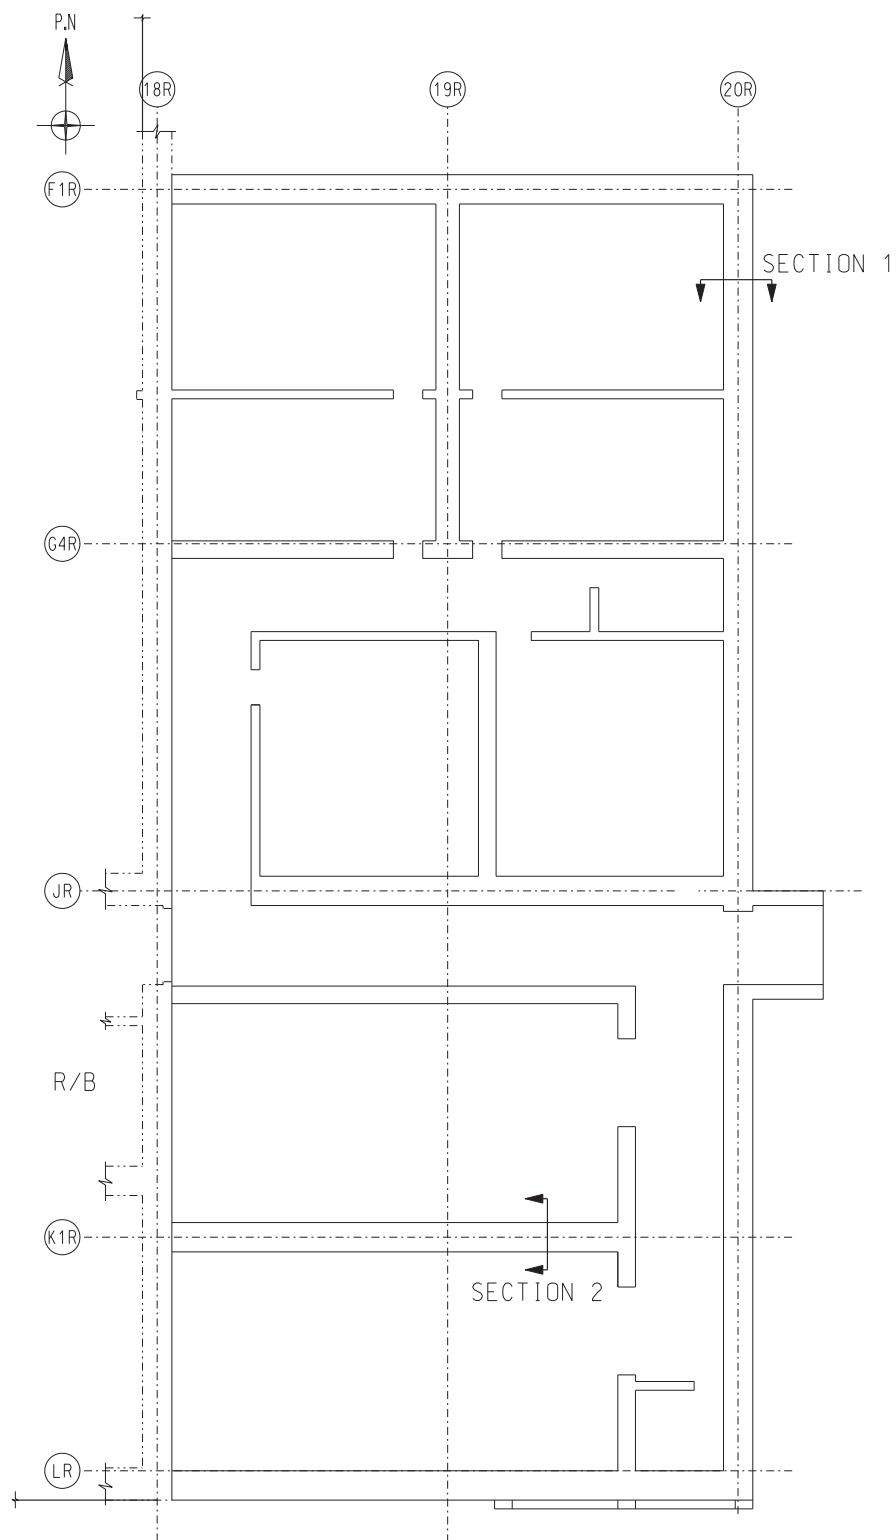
Typical Reinforcement in Floor at Elevation 3'-7"- AREA 1
